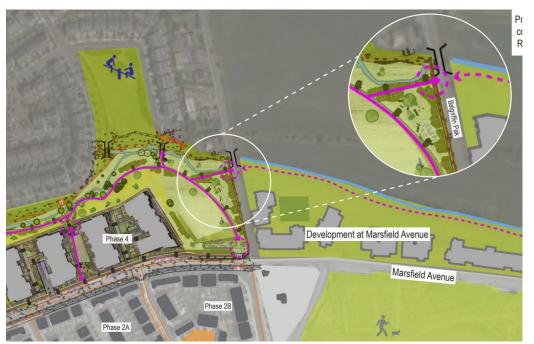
Proposed crossing point at Balgriffin Park to connect the linear park
